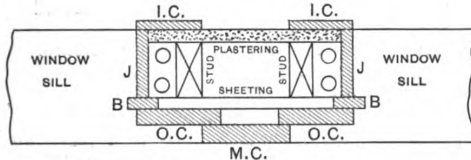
Horizontal Section of Bay Window, Showing Casings and General Construction.—Scale, 1 Inch to the Foot.
